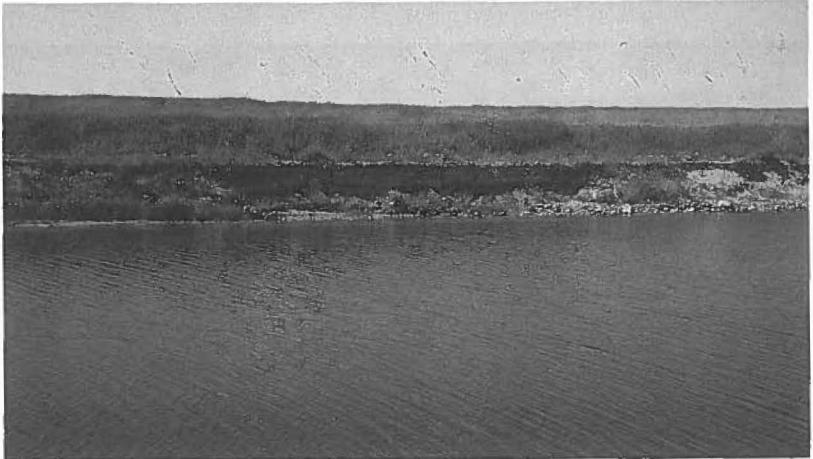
A typical example of erosion and sloughing of the canal banks (side slopes).
